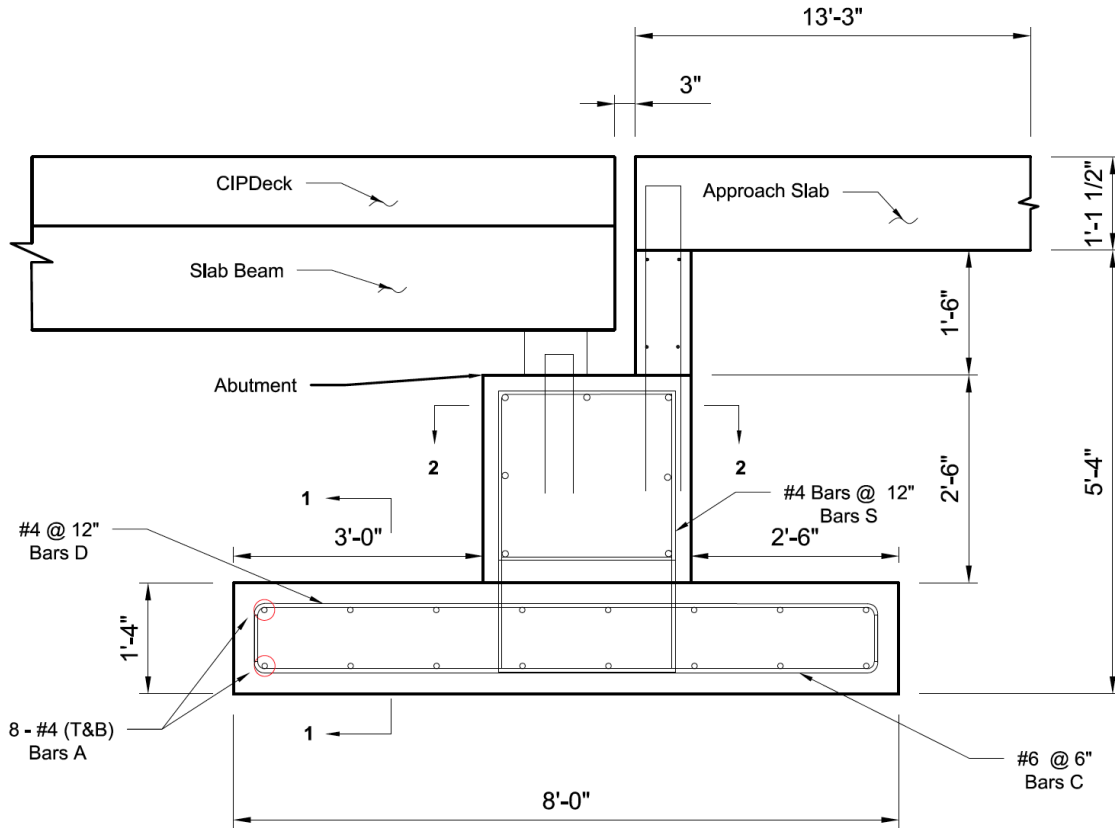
Dimensions and Reinforcement of Footing and Abutment.
